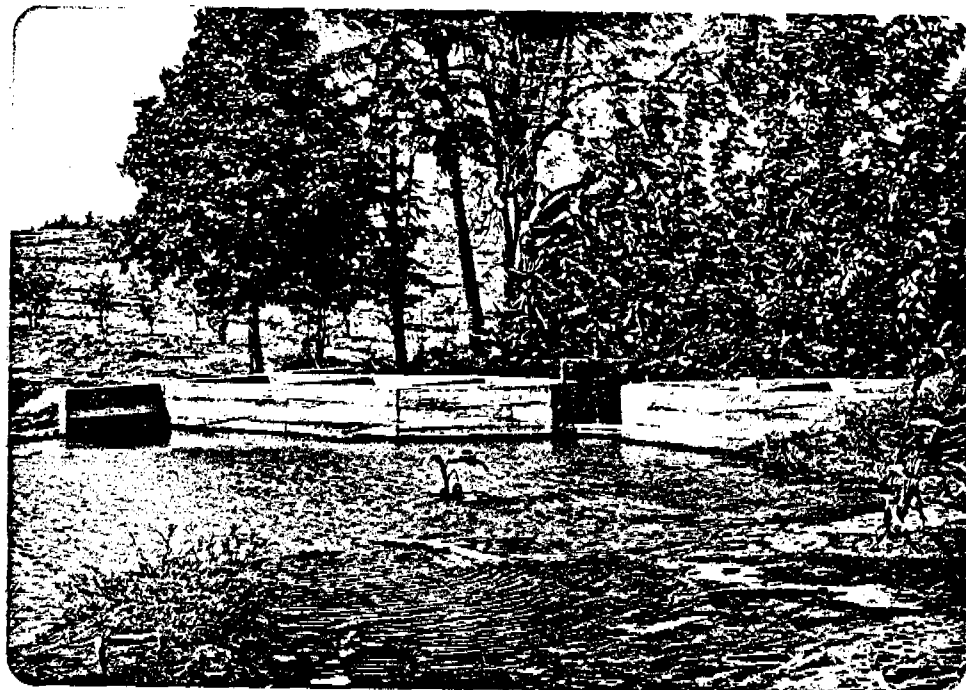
A concrete dam constructed on a hill to block the way of the natural stream, Ban Thadingam, Lopburi Province.
